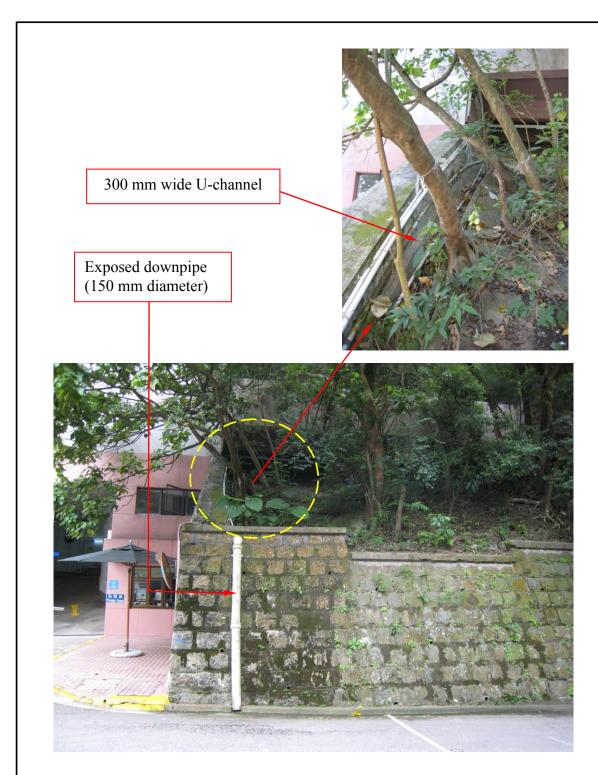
Exposed Downpipe and U-channel at the Eastern End of Retaining Wall No. 11SW-A/F677 (Photograph taken on 5 September 2007)
